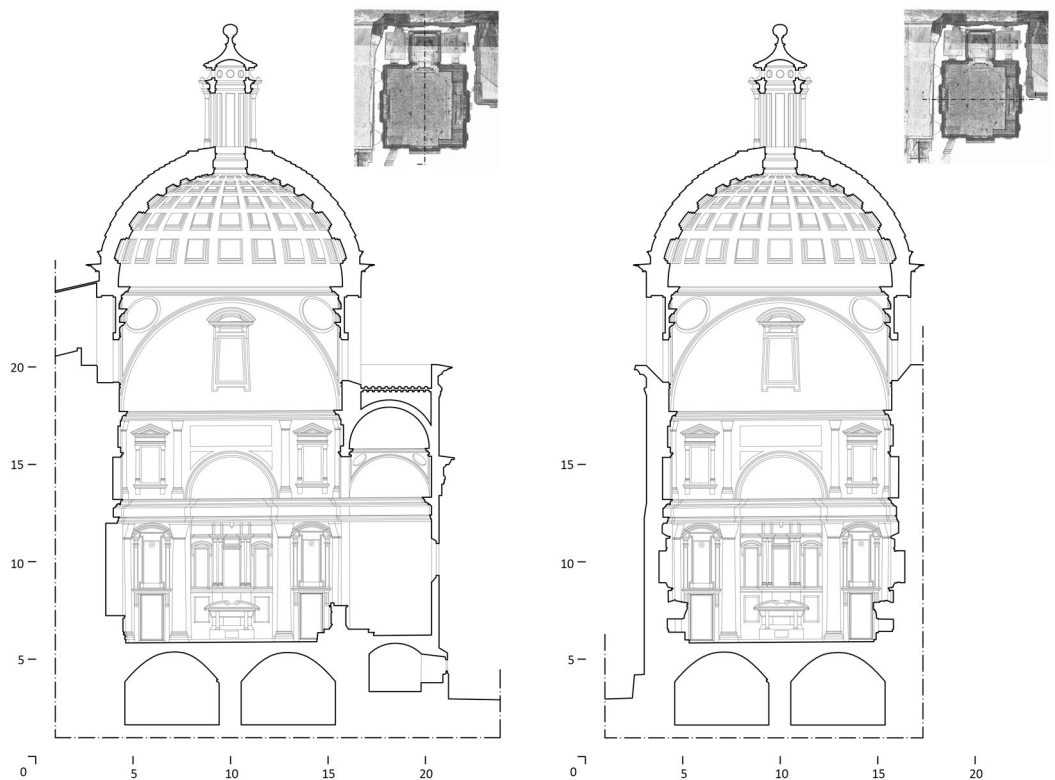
Longitudinal section of the Sagrestia Nuova.
